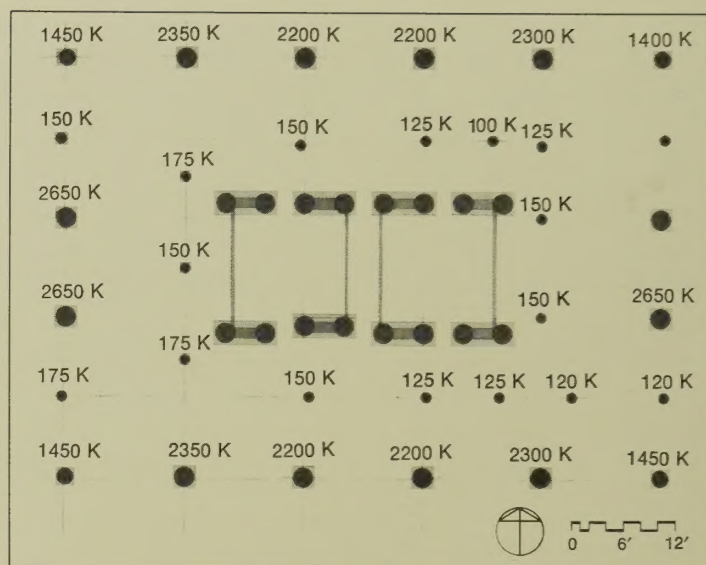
The Stelco Tower foundation plan with caisson load-carrying capacities indicated.
